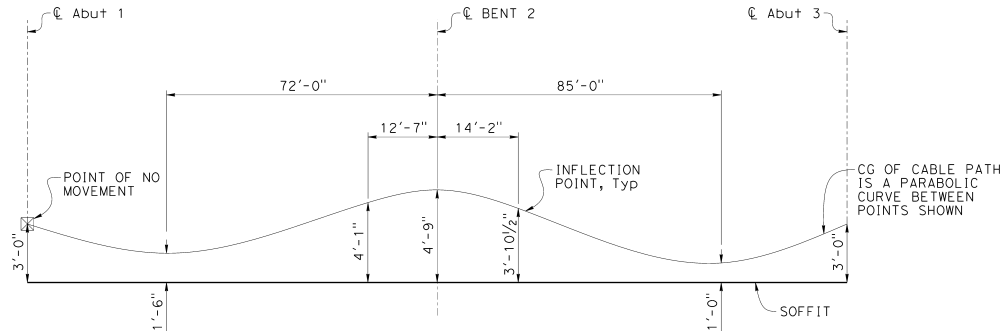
Unequal Span Bridge Path of CG of Prestressing Force
